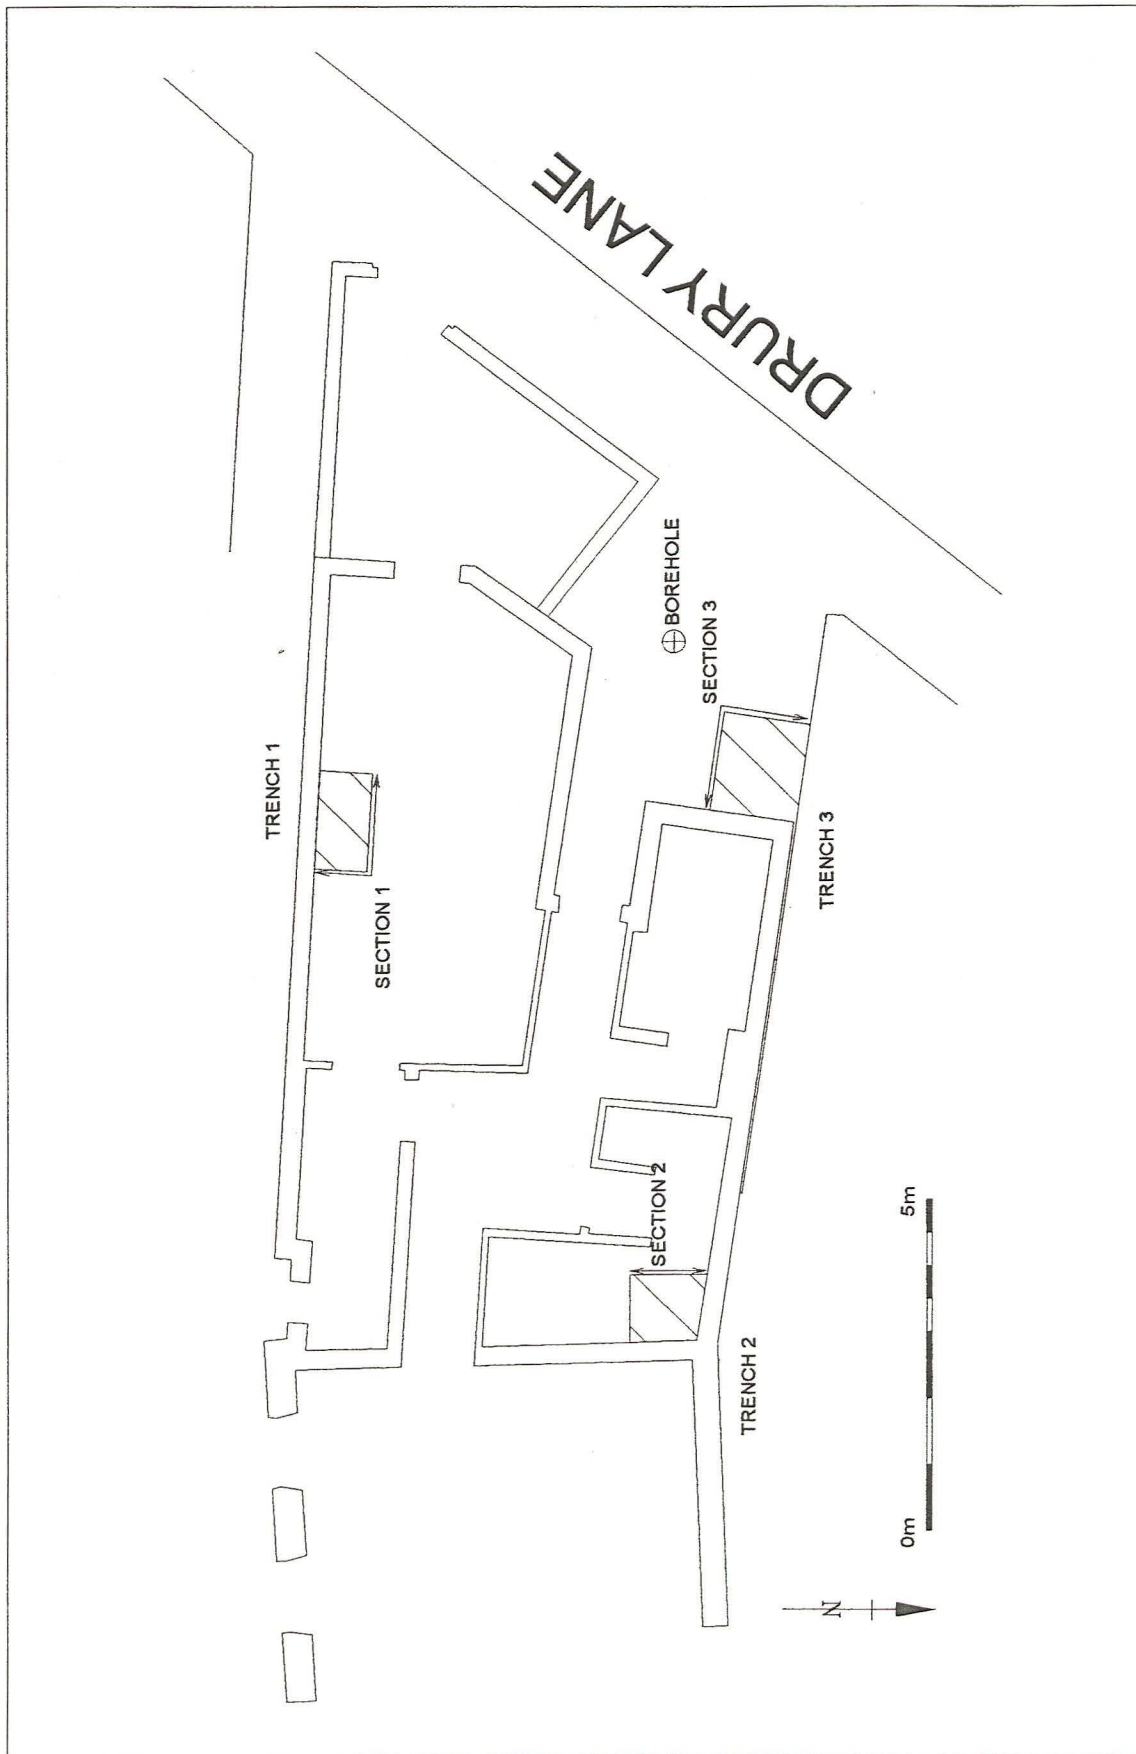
Plan showing location of geotechnical trial pits and borehole.
